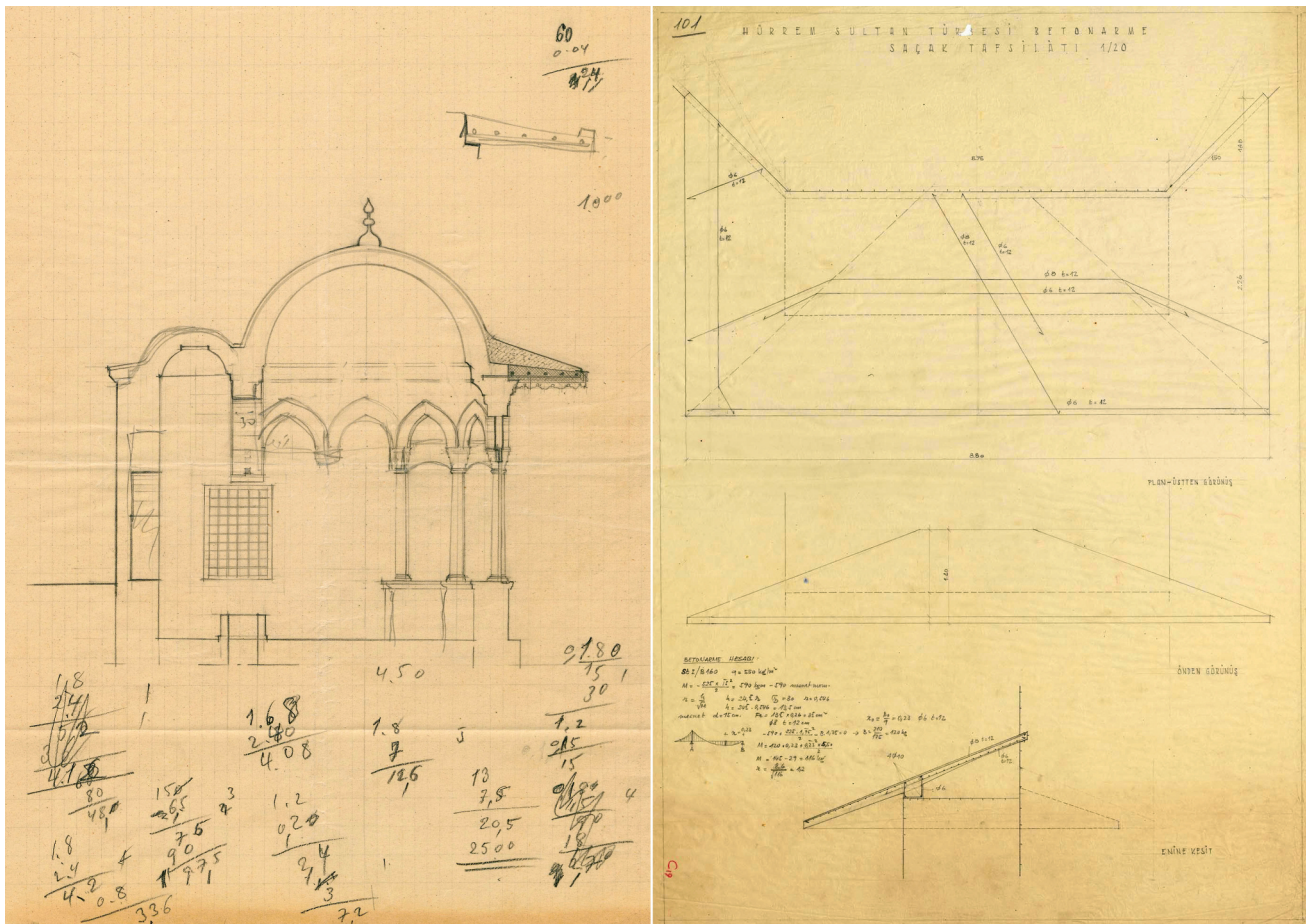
Examples of eaves constructed with reinforced concrete: Ibrahim Paşa Fountain (source: Ali Saim Ülgen Archive, Salt Research 1943) and Hürrem Sultan tomb with reinforced concrete canopy detail (source: Ali Saim Ülgen Archive, Salt Research n.d.-b).
